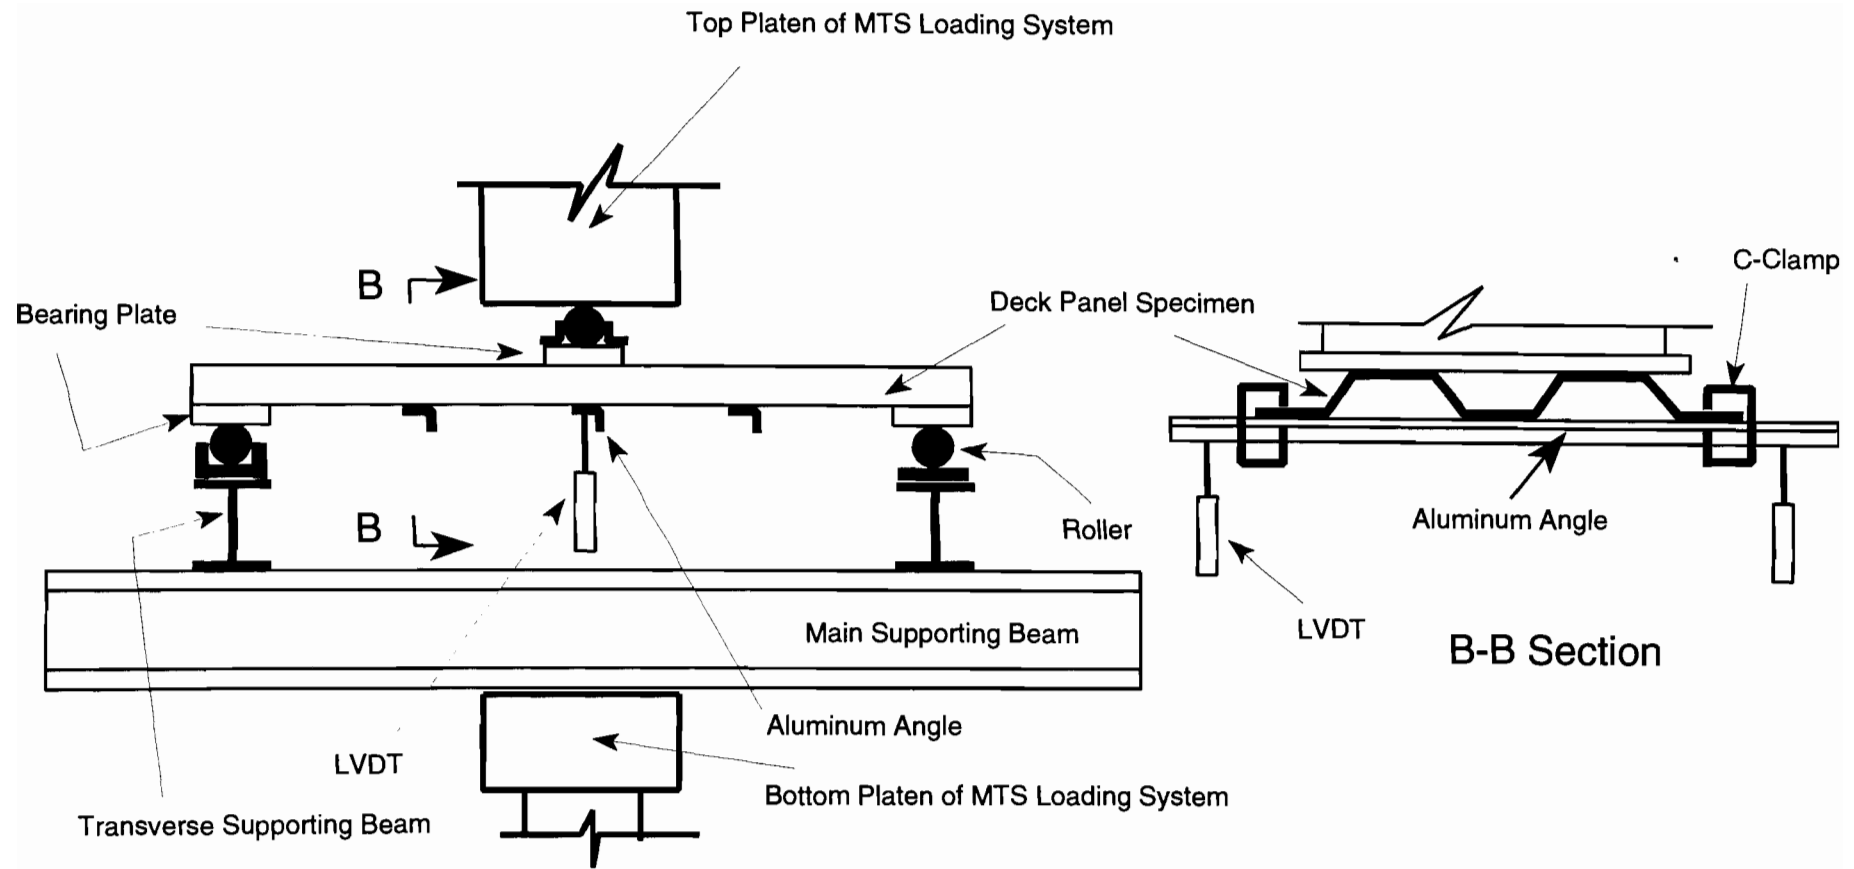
Test Setup for Deck Panels with One-Point Loading Condition
